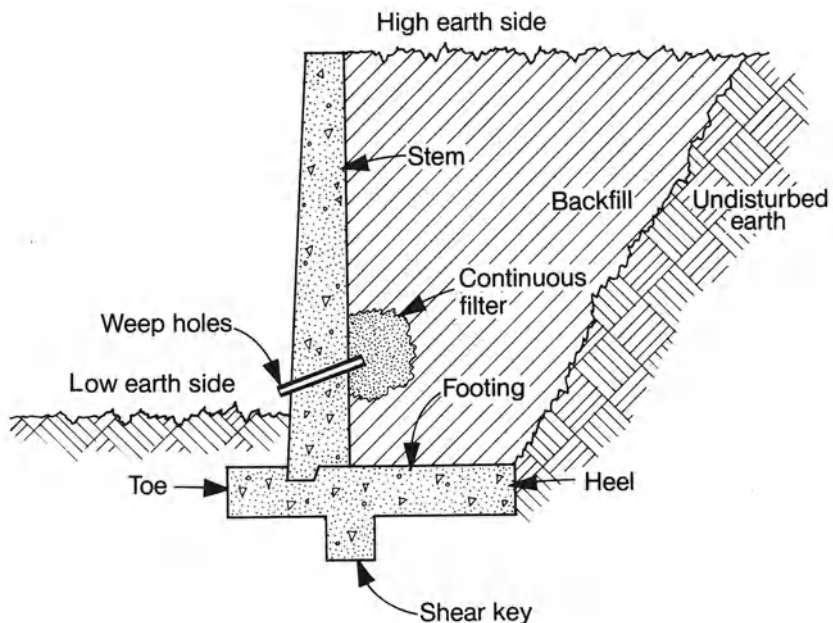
Typical detail of a cantilever retaining wall.
